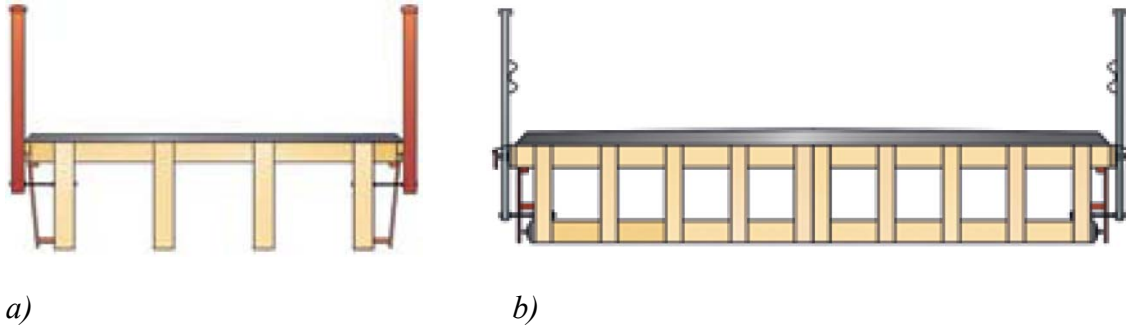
Timber T- and box-beam bridge cross sections. a) T-beam bridge deck. b) Box-beam bridge deck. (Martinsons, 2010)
